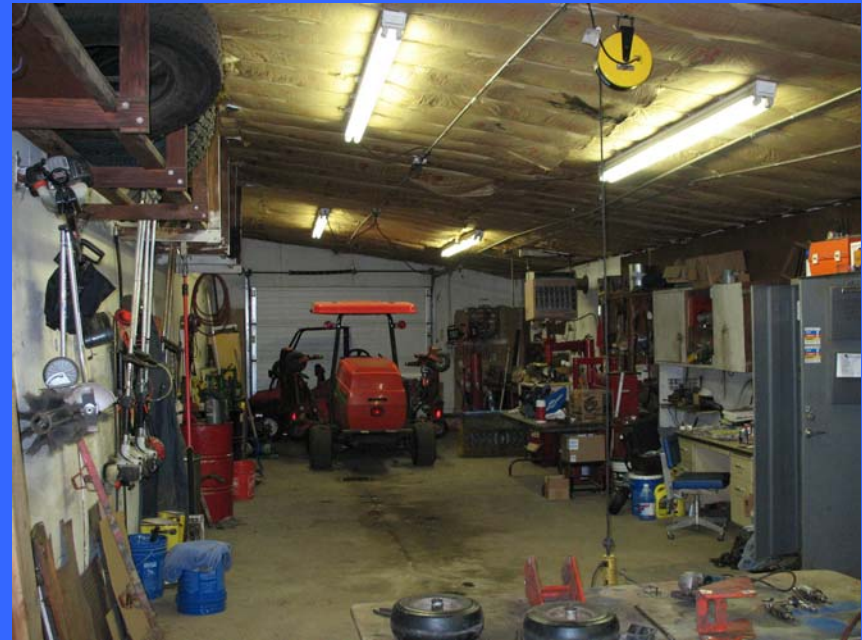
PHOTOS EXISTING GOLF MAINTENANCE BUILDING
